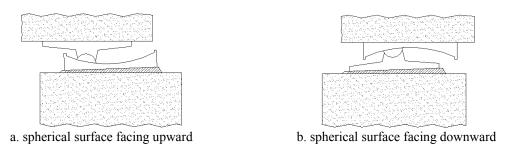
Rotation of the bottom part of a FP bearing installed out-of-level
